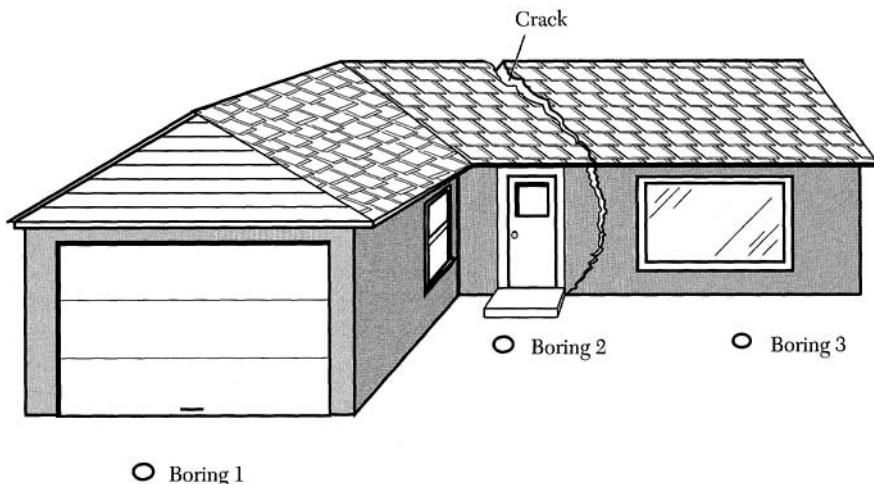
Sketch of the house, boring locations, and crack.
